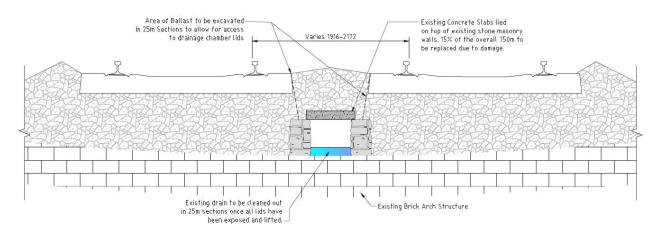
Typical section on Phoenix Park Tunnel showing existing drainage (note: central channel has since been infilled with a 300mm pipe and backfilled with granular material)
